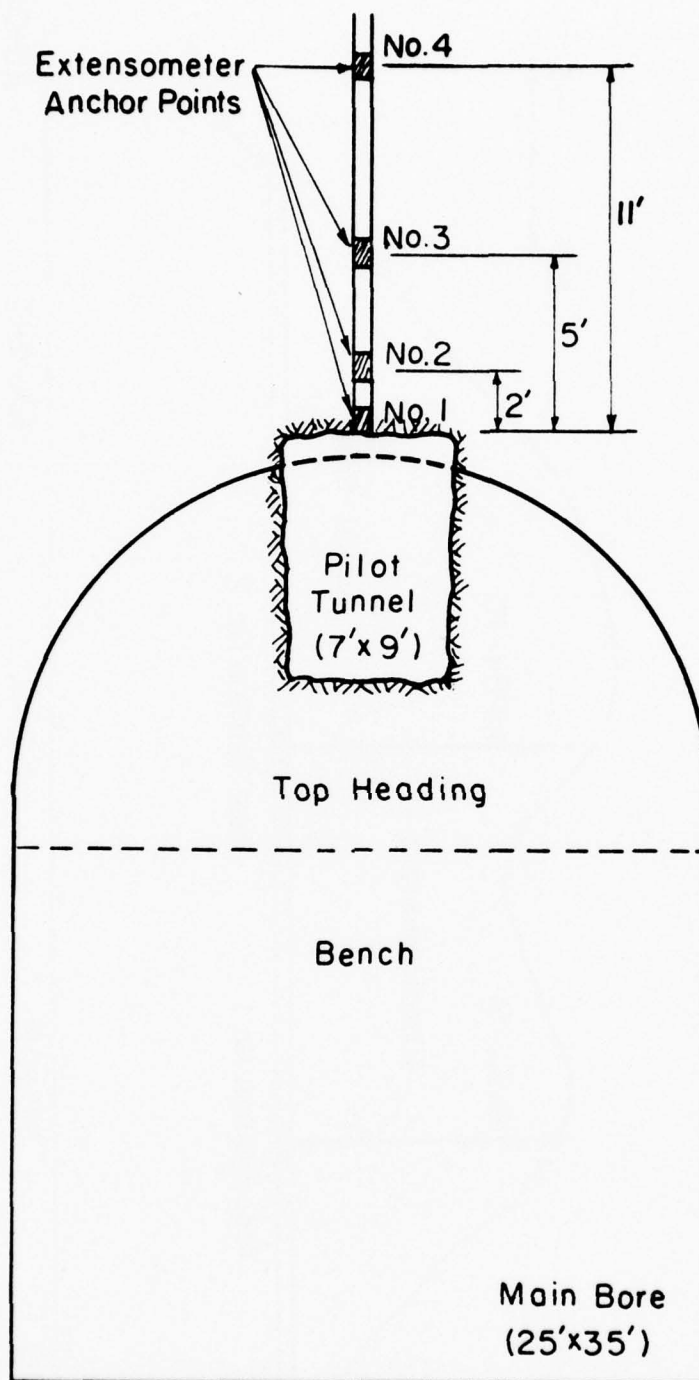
Section of Bonneville Pilot Tunnel, Main Bore and Test Station Extensometer
